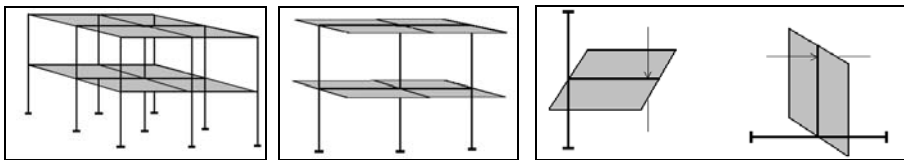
Spatial frame, Plane frame sub-assemblage and Testing setup outline for horizontal T and inverted T specimens.
